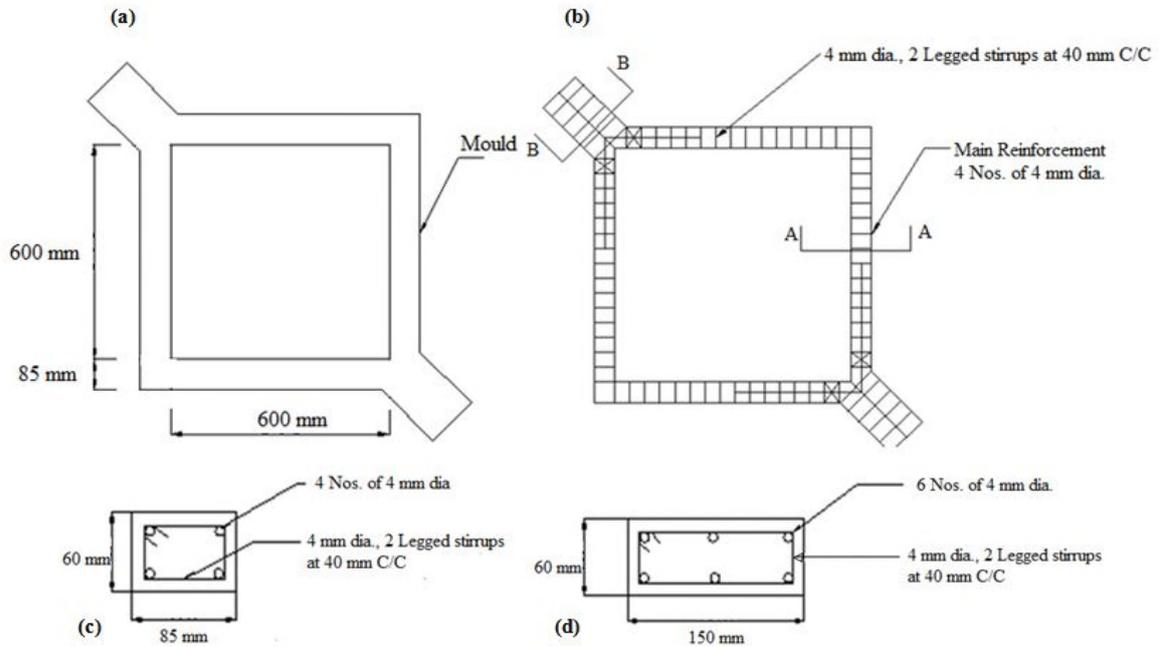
Schematics of (a) mould (b) reinforcement (c) cross section AA and (d) cross section BB
